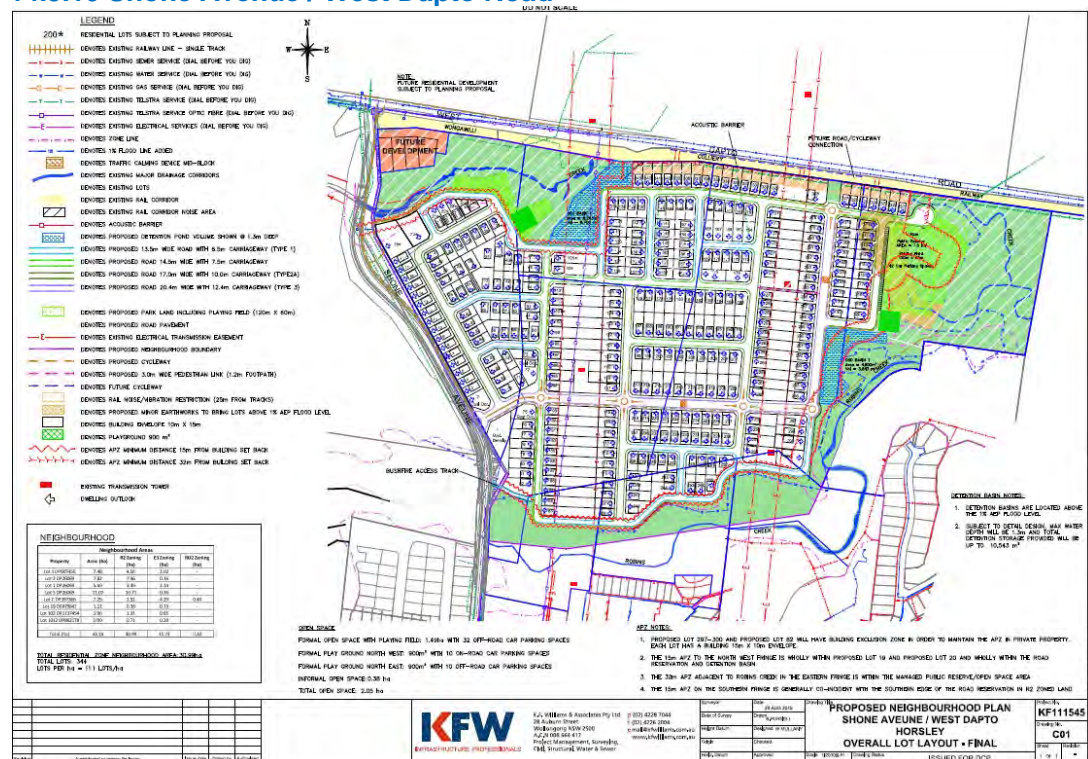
Shone Avenue and West Dapto Road Neighbourhood Plan
